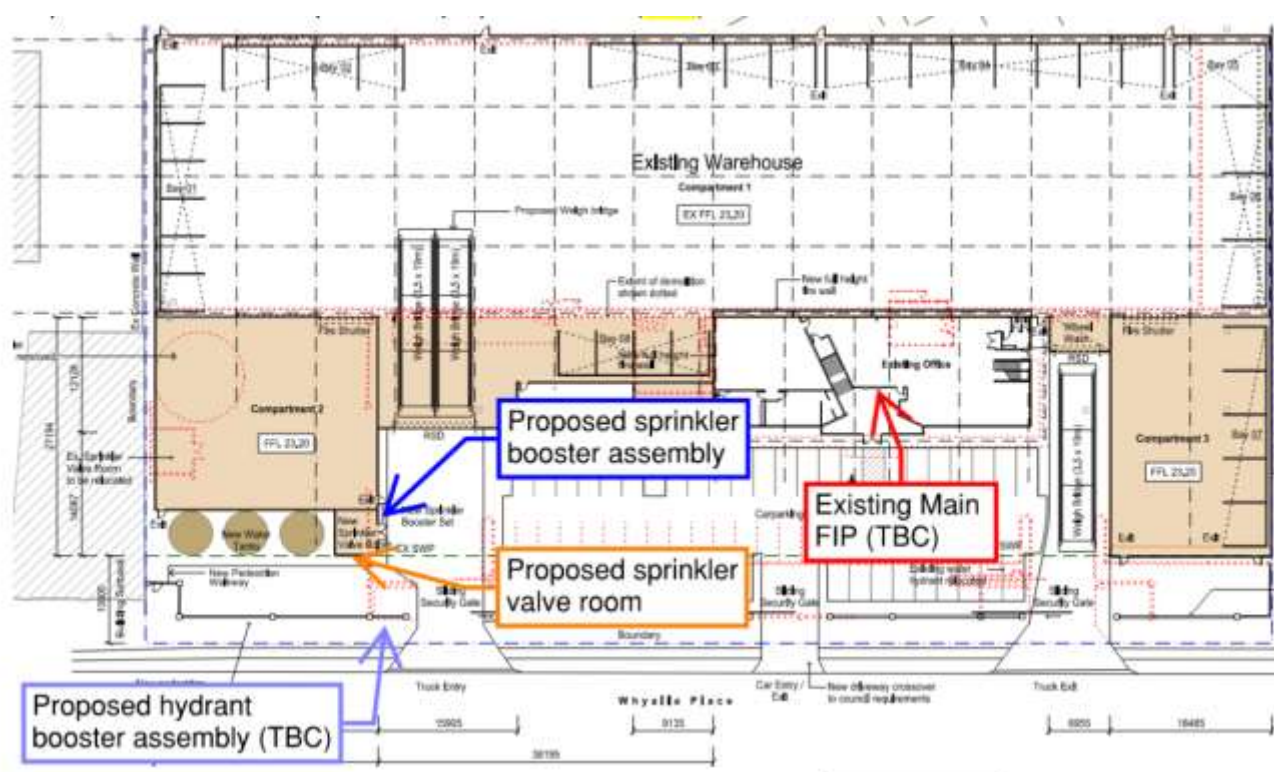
Proposed fire services at the Site (as adopted from Figure 5-1 Appendix K)
